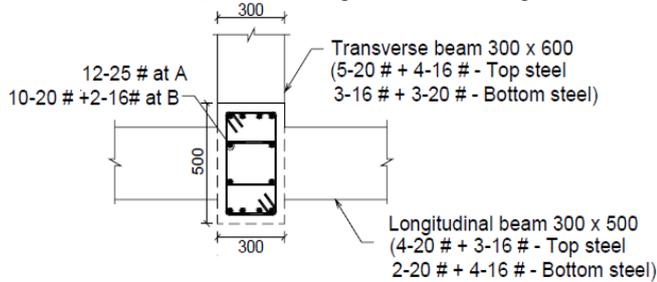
Reinforcement Details of Longitudinal and Transverse Beam
